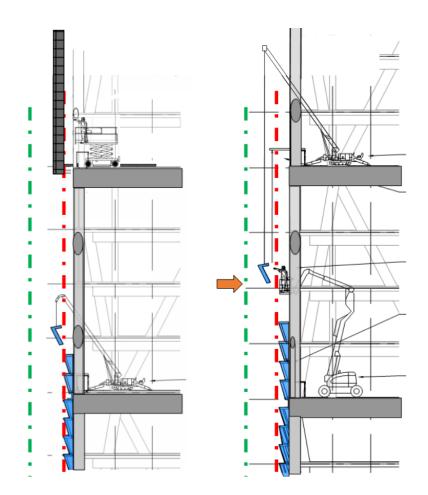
Indicative Façade Installation Procedure on Eastern Elevation
